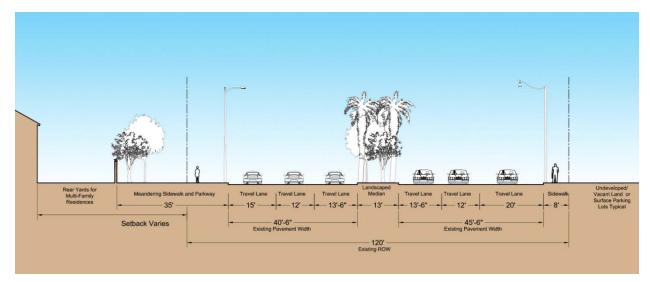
Typical Cross-Section along Foothill Boulevard in the City of Fontana
